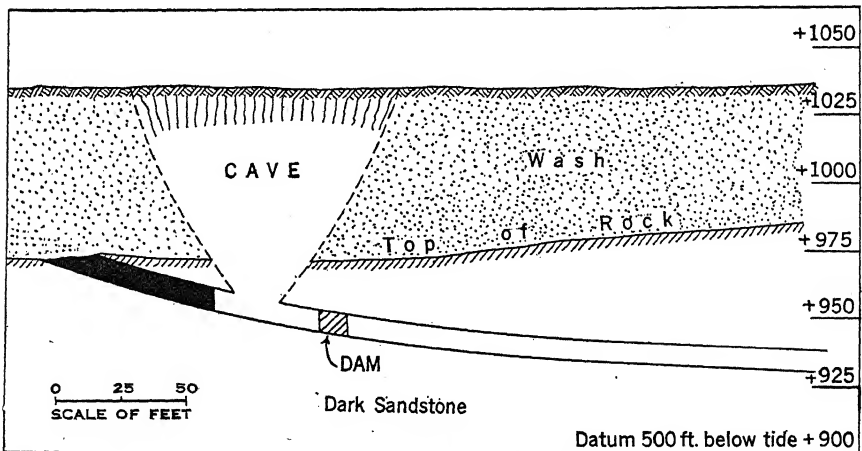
CAVE TO HILLMAN VEIN, IN 1876.
